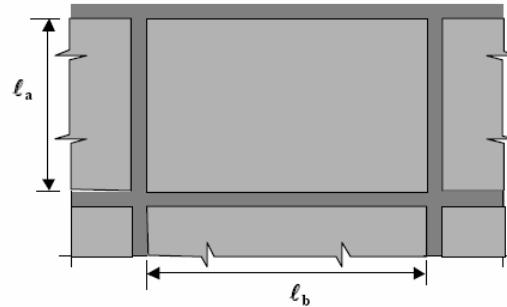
Edge panel with ℓ_b parallel to edge, of two-way slabs supported on girders, beams or walls
